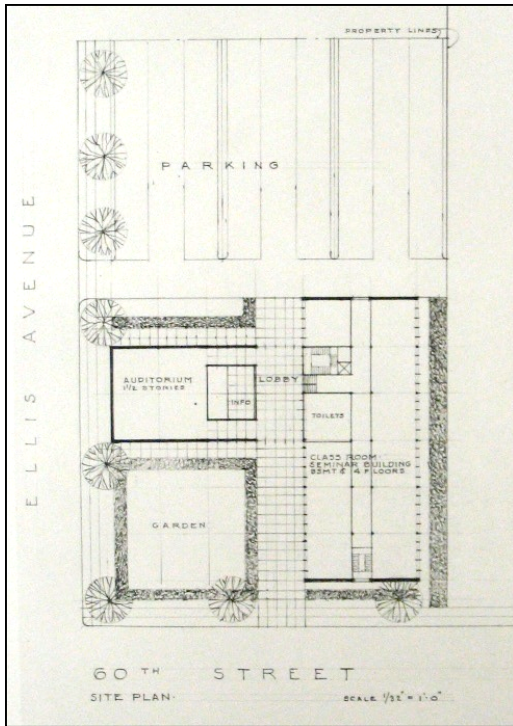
Initial site plan commissioned by UC board of trustees. Plan is oriented south at the top. The parking lot serves as a buffer to the Woodlawn neighborhood beyond 61st St. Grounds and Buildings Photographs. UCSC.
